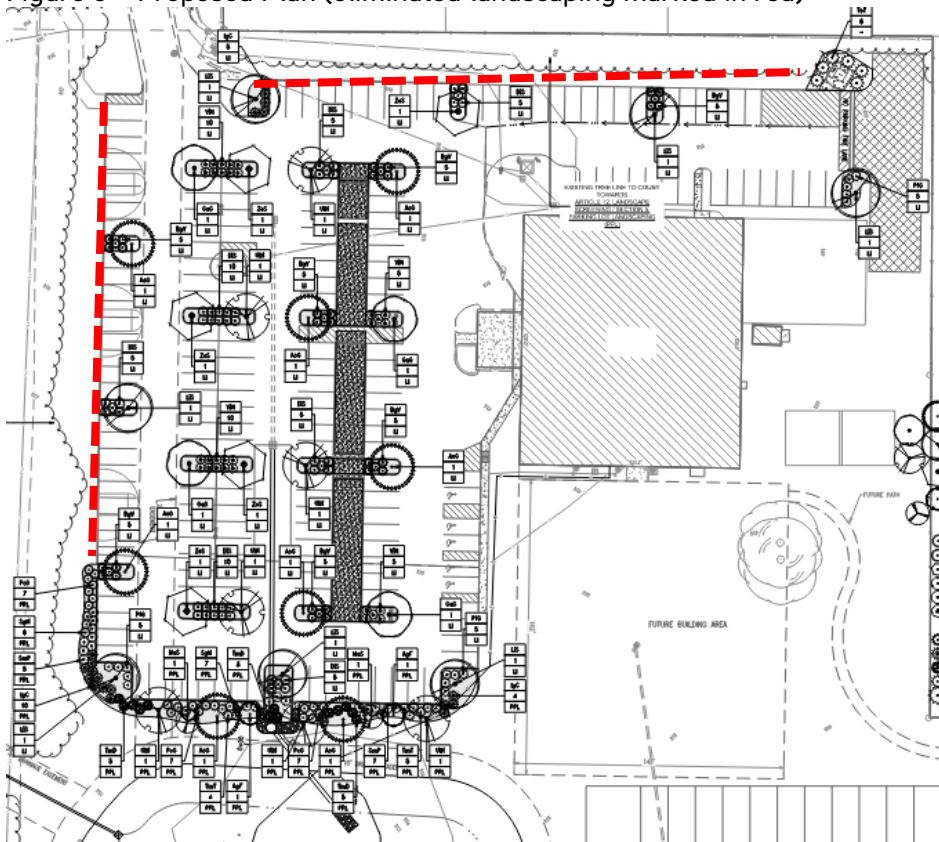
Proposed Plan (eliminated landscaping marked in red)
